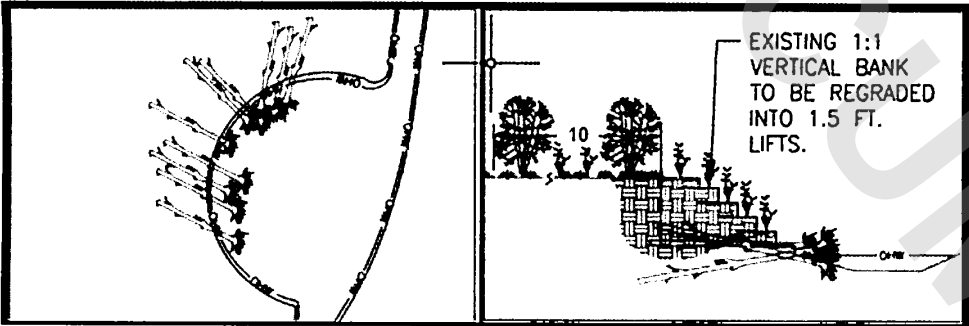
Typical Bank stabilization plan. Exact wood placement will be field fit.
